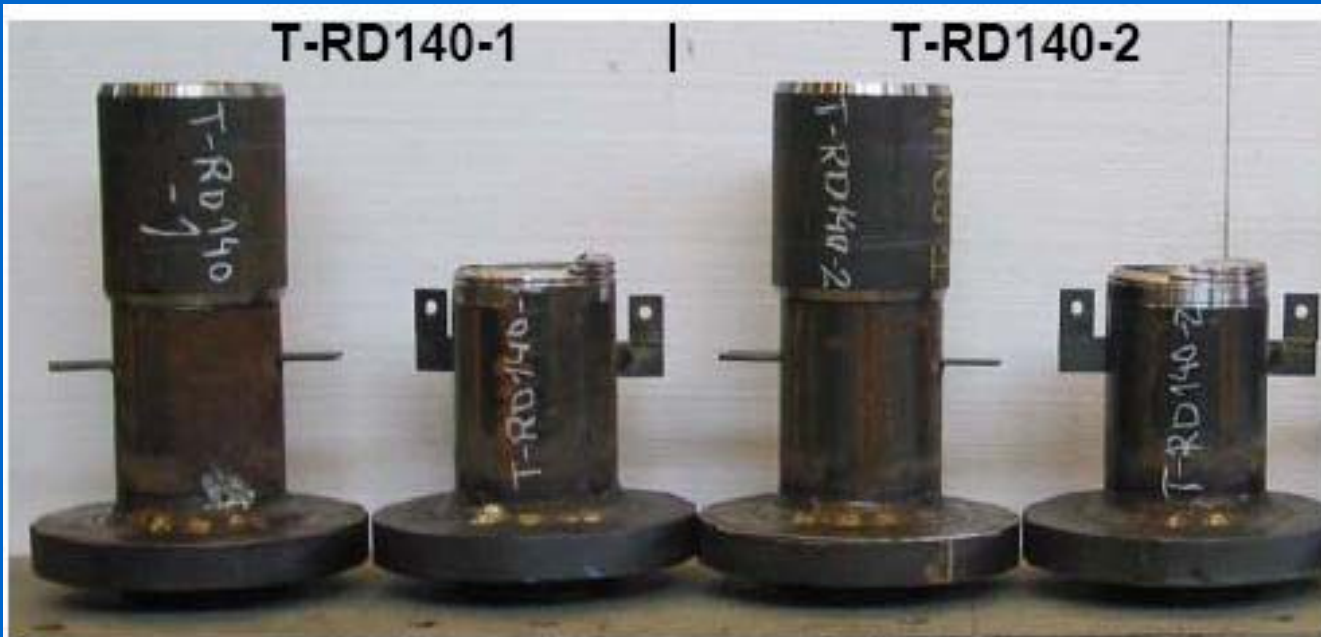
Test specimens after tensile tests, threaded sleeve splices RD140/10.
